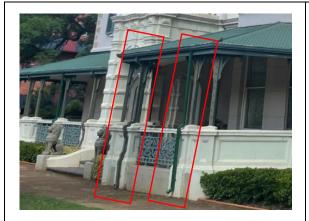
Old gutter (left) and new gutter (right) on front of house.
